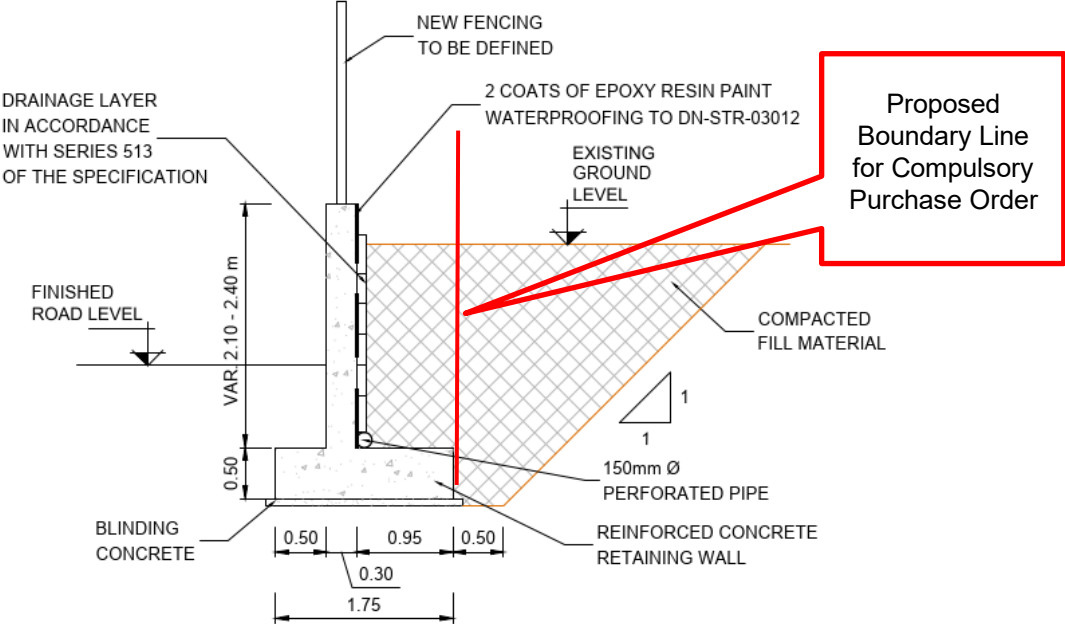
Section at Structure Ballymun 05 Retaining wall
